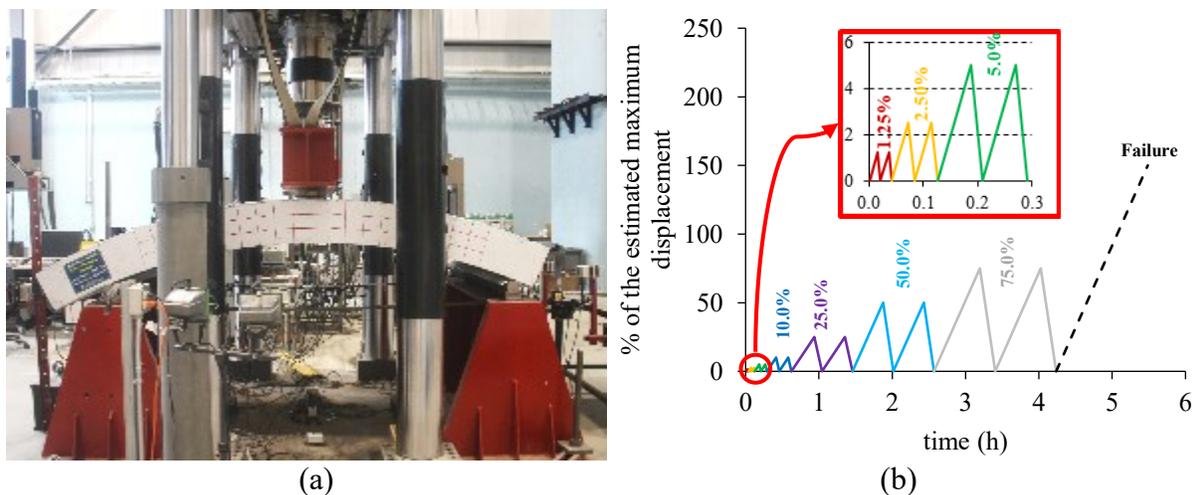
(a) Test setup; and (b) quasi-static cyclic loading scheme for the tested segments.
